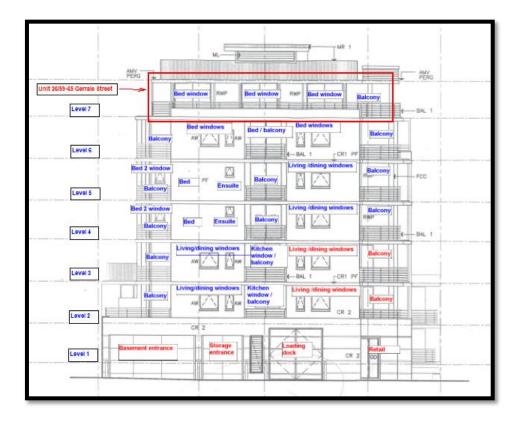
Western elevation of 59 to 65 Gerrale Street, Cronulla
